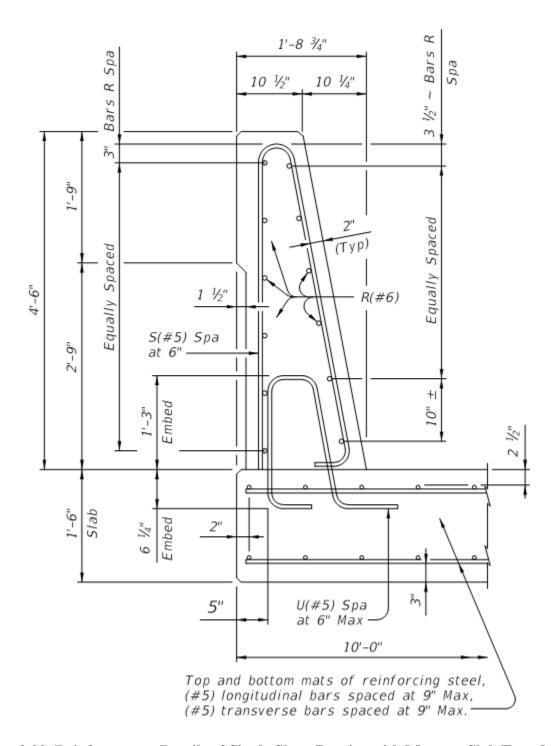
Reinforcement Details of Single Slope Barrier with Moment Slab Foundation.
